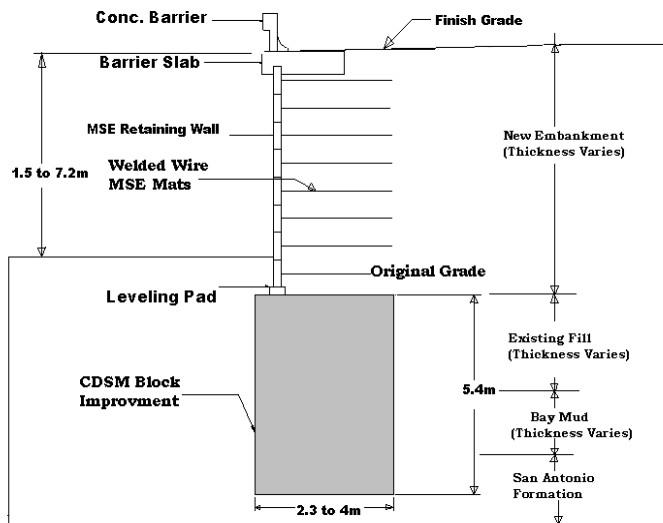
CDSM foundation under MSE wall and embankment, Oakland Airport Roadway Project
